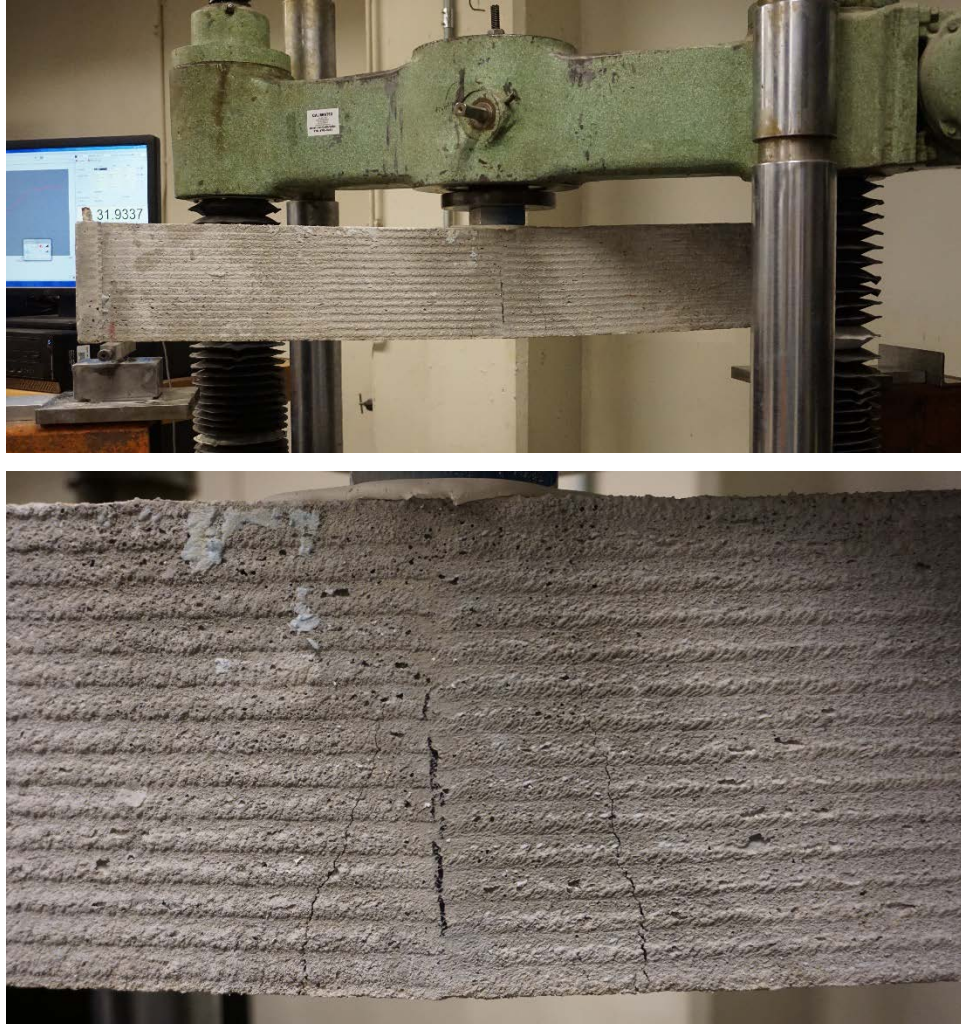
CNC wire-reinforced beam shows ideal ductile failure after loading, closeup of flexural cracks
